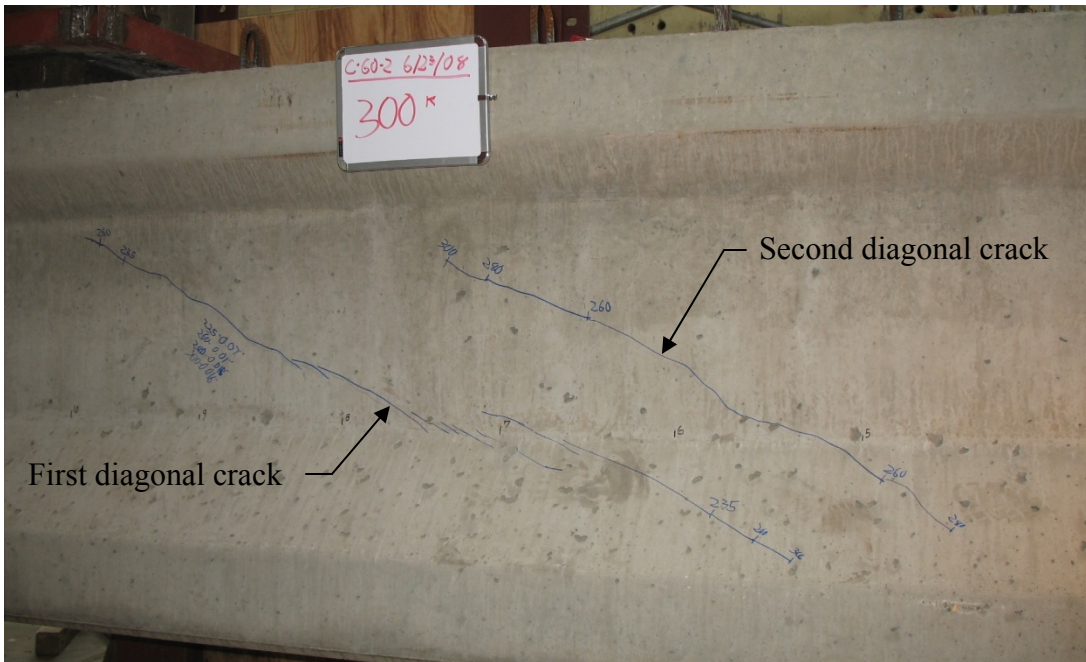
Second Diagonal Crack on Beam CB-60-2
